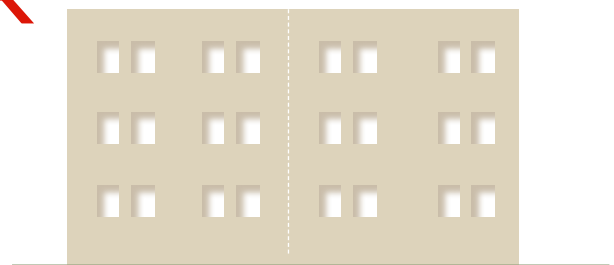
Long monotonous facades, large scale symmetry without facade breaks should be avoided
